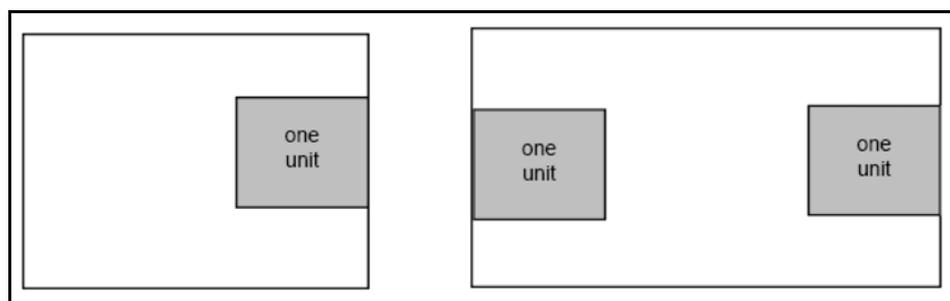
Residential Single Detached (Zero Lot Line)
